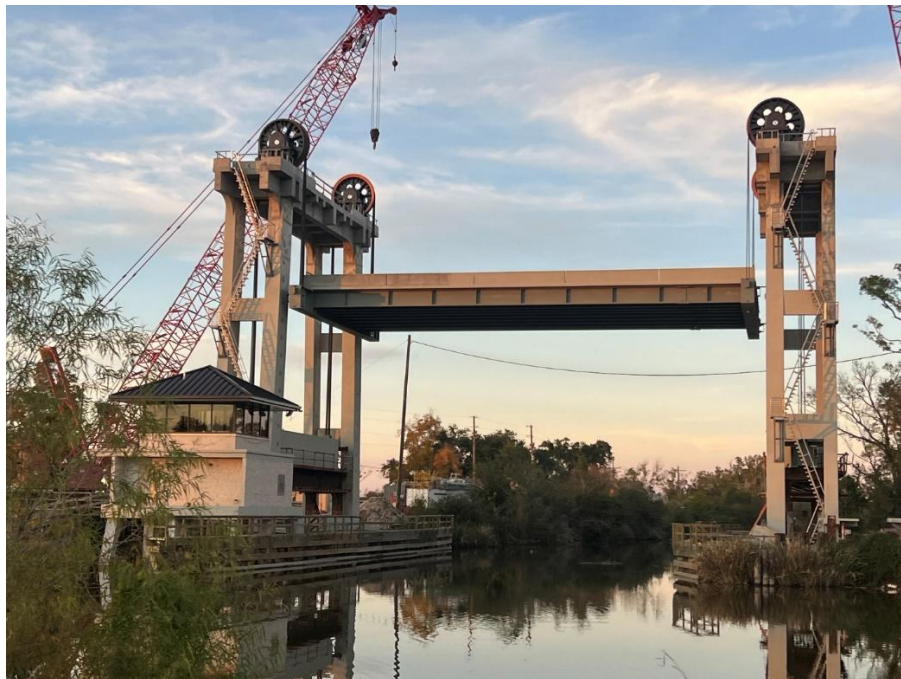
Tower drive vertical lift with concrete towers and steel plate girders, with two sets of drive machinery.
